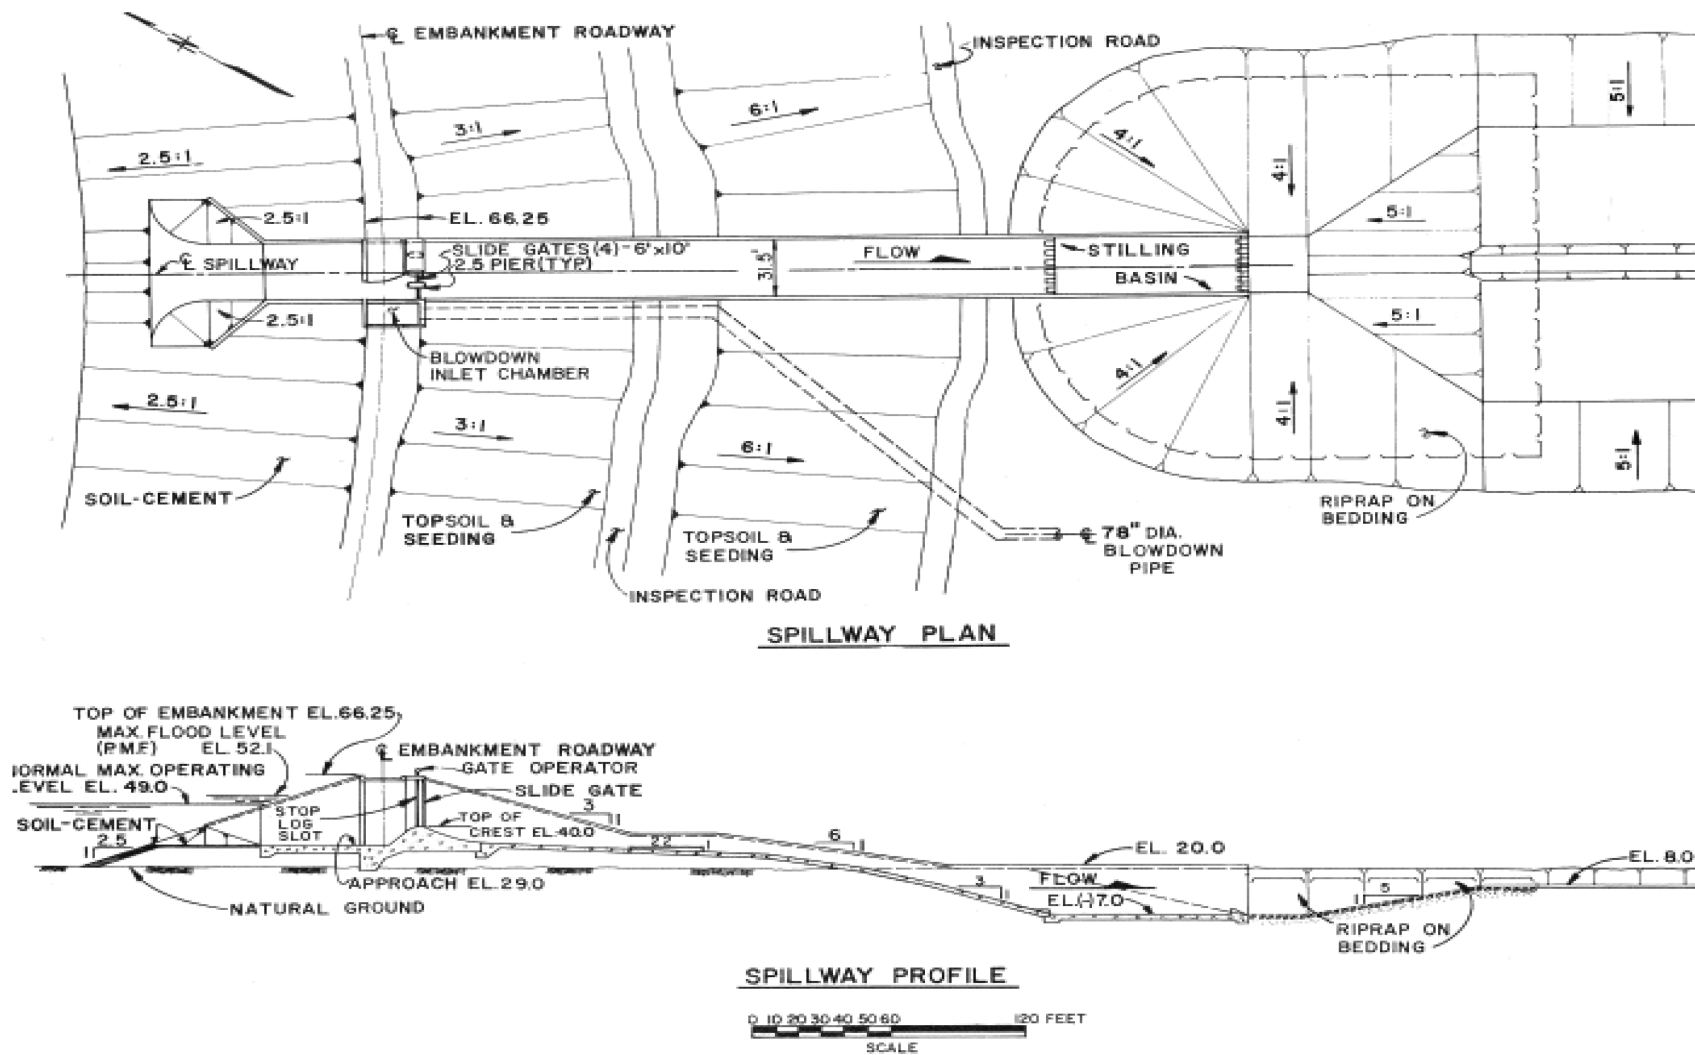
Sheet 1, STP 3 &amp; 4 Spillway Structure
